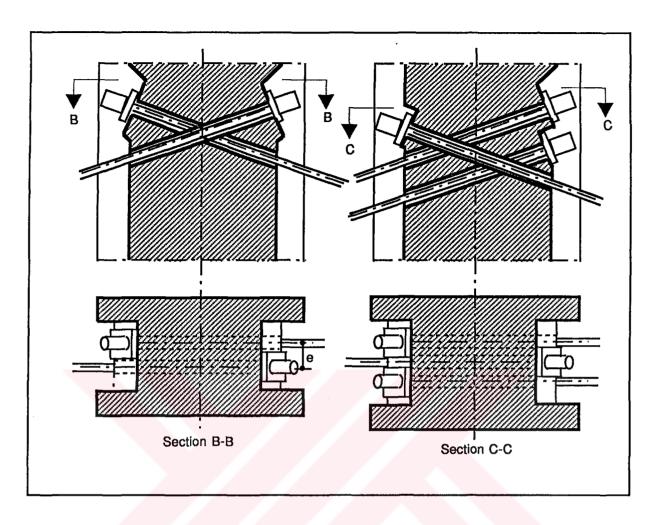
OVERLAPING OF STAY CABLE ANCHORAGES IN A CONCRETE PYLON
